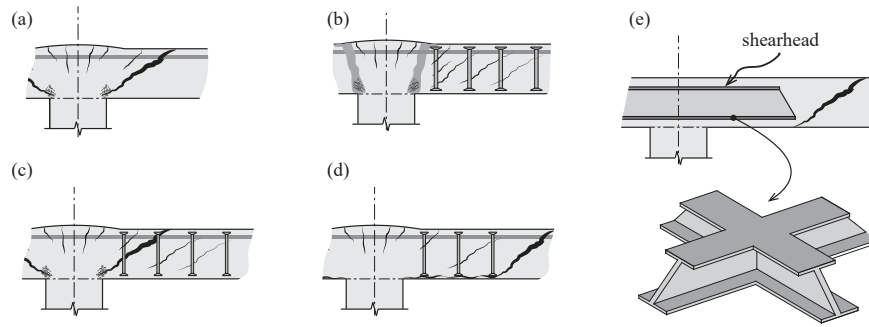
Punching failures of flat slabs: (a) members without shear reinforcement; (b) crushing of concrete; (c) cracking development with shear-reinforced zone; (d) punching outside shear-reinforced zone and (e) example of steel shear head embedded in slab.
